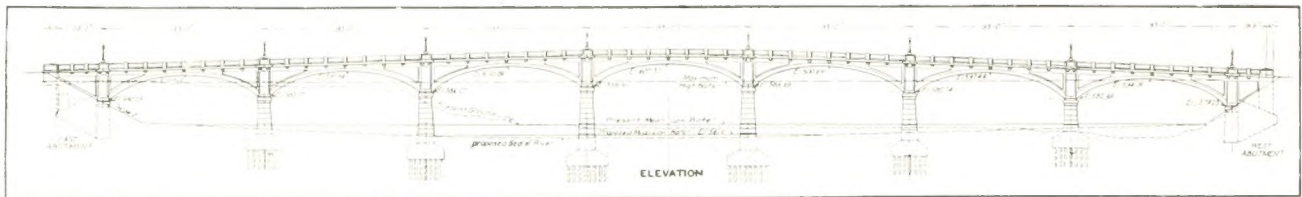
ELEVATION OF BLACK STREET BRIDGE.
